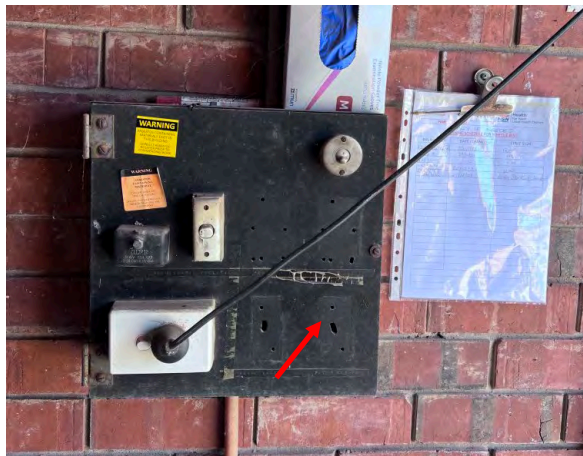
Contaminated Waste – Internal northern wall assumed asbestos electrical backing board
